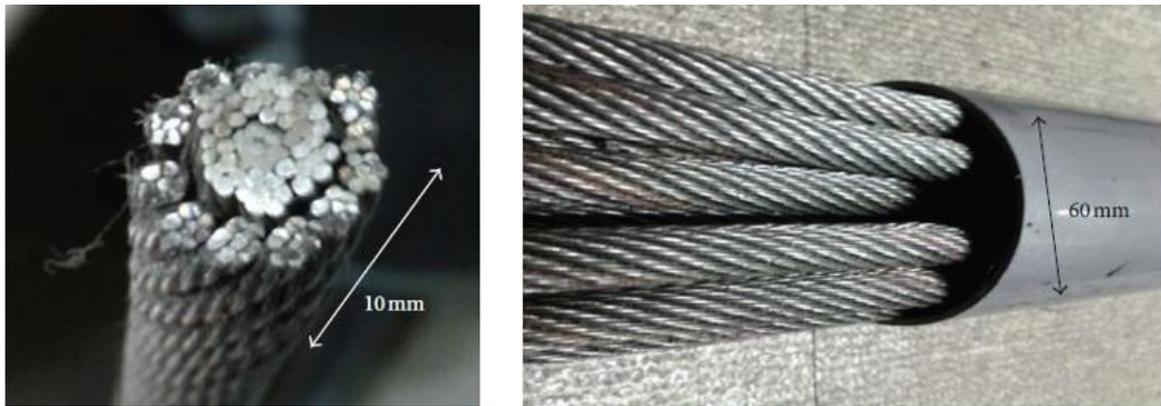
Testing Specimen Illustrations (Park et al., 2014)
